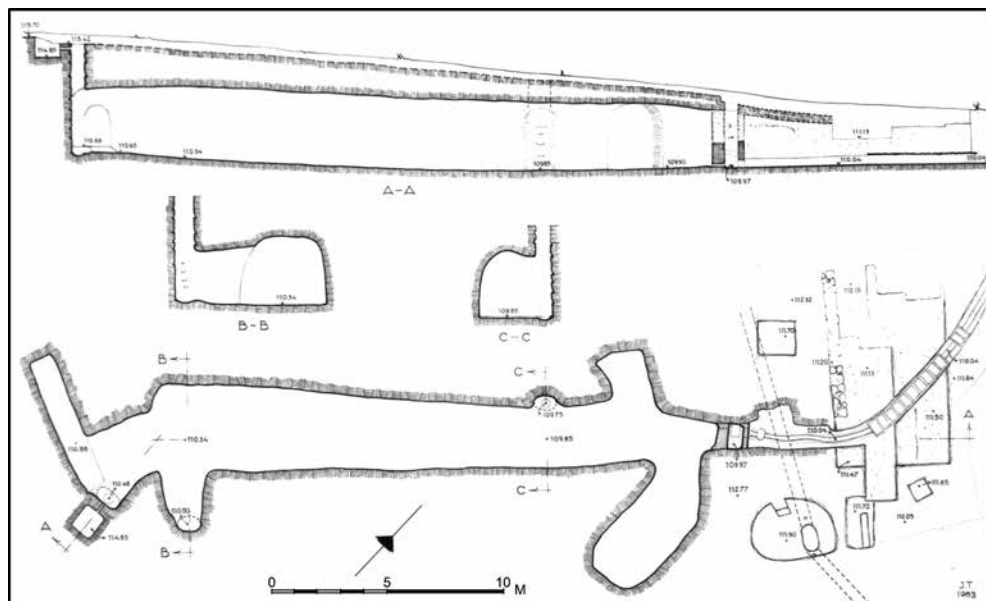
Plan and section of the Anaploga Cistern. ASCSA.net: Corinth Excavations, Drawing 261.
